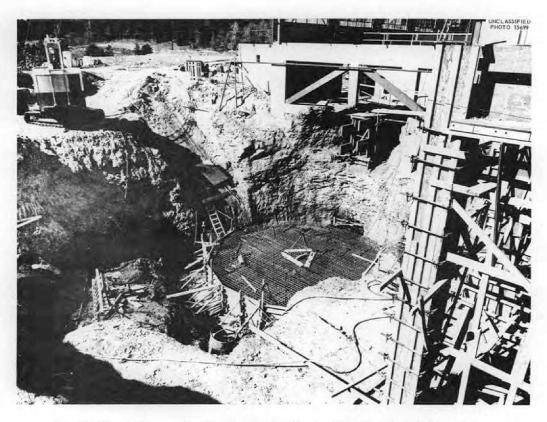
View of Excavation Showing the Reinforcing Steel for the Cell Foundation.
